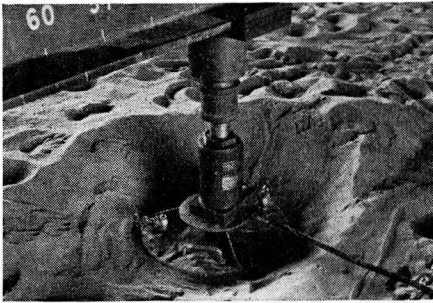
Jack in Loading Position on 250-Sq. In. Plate
